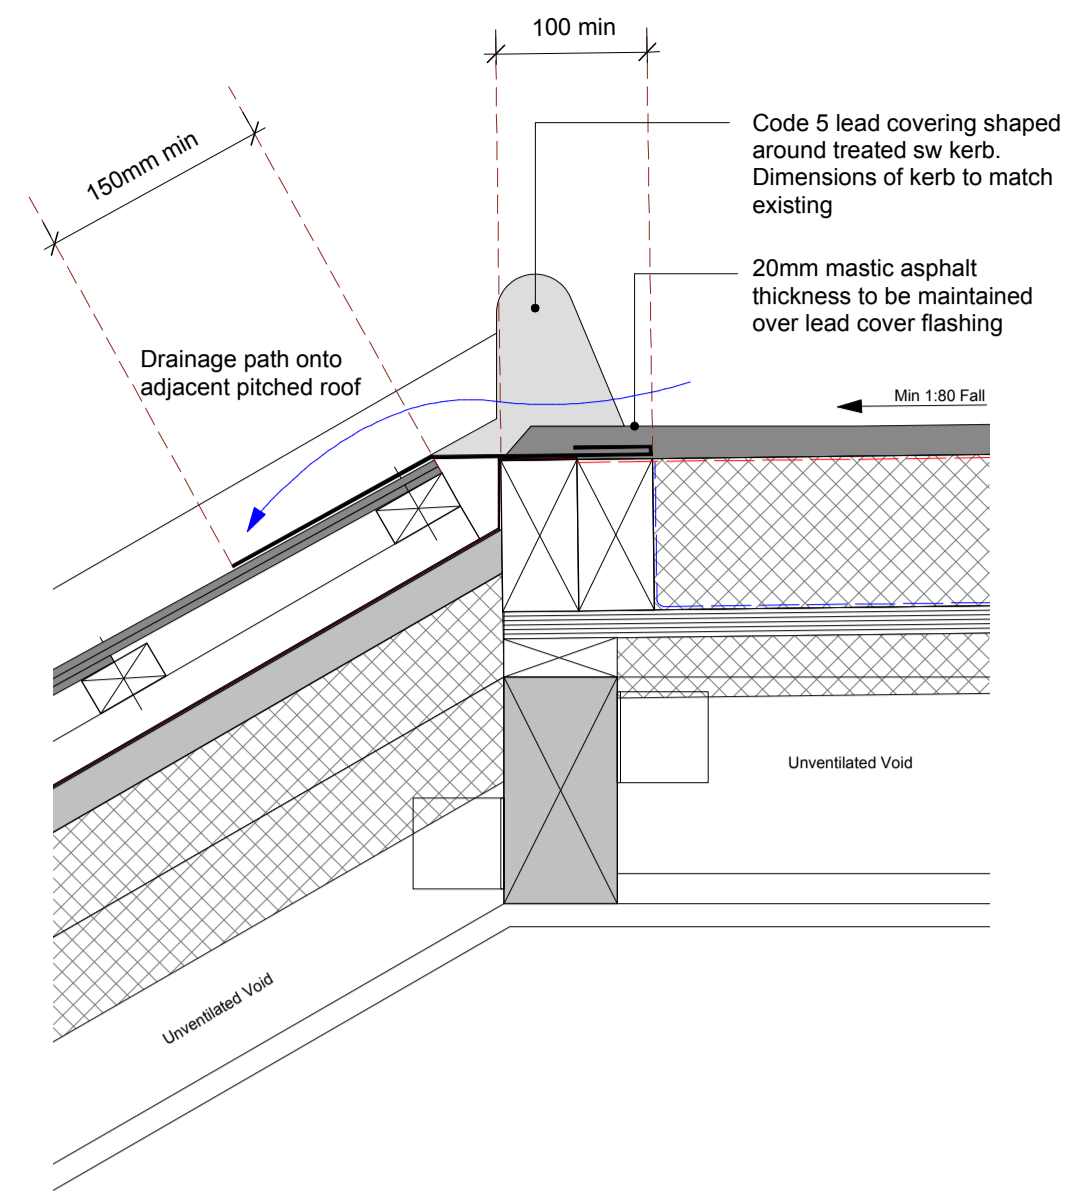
Typical Tile Pitched Roof / Mastic Asphalt Flat Roof Junction (1:5 @ A1)
